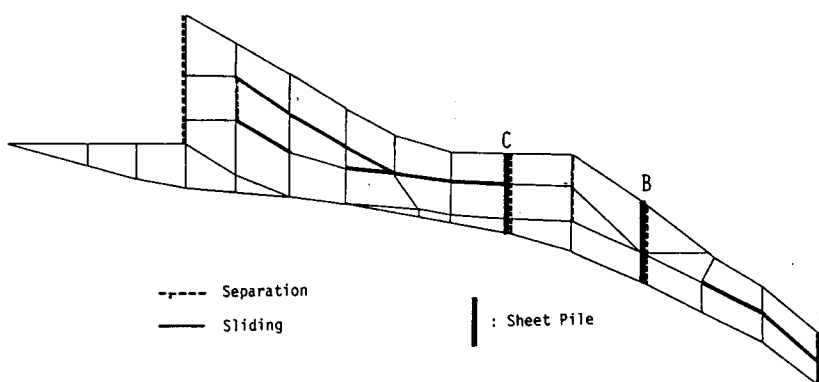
Joint elements showing separation and sliding when three sheetpiles are driven into points A, B and C.
